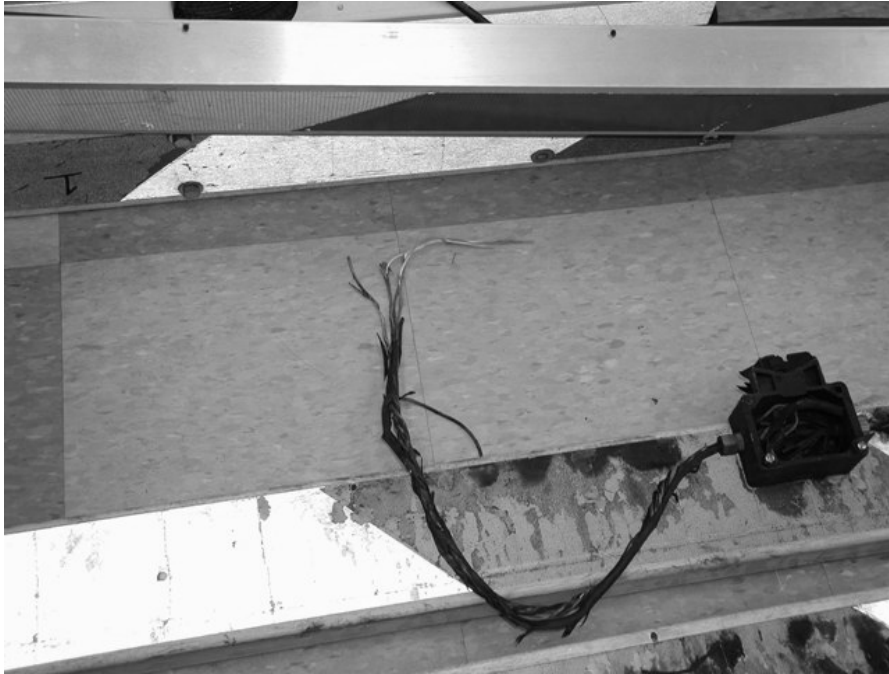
Damaged gate arm, flashing light unit, and copper wire
